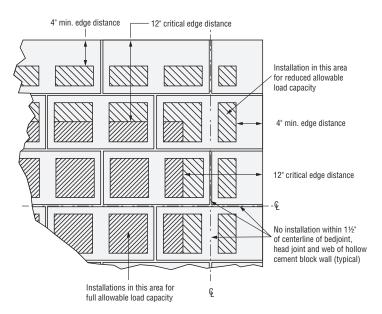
Allowable Anchor Locations for Full and Reduced Load Capacity When Installation Is in the Face of Hollow CMU Masonry Wall Construction
